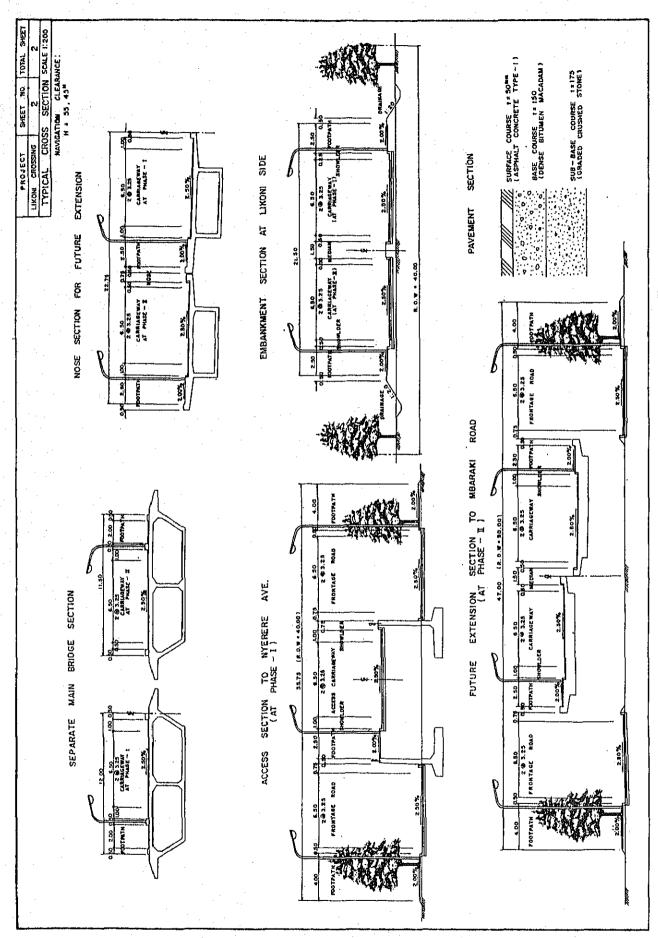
TYPICAL CROSS SECTION FOR 55 AND 45 ^m
